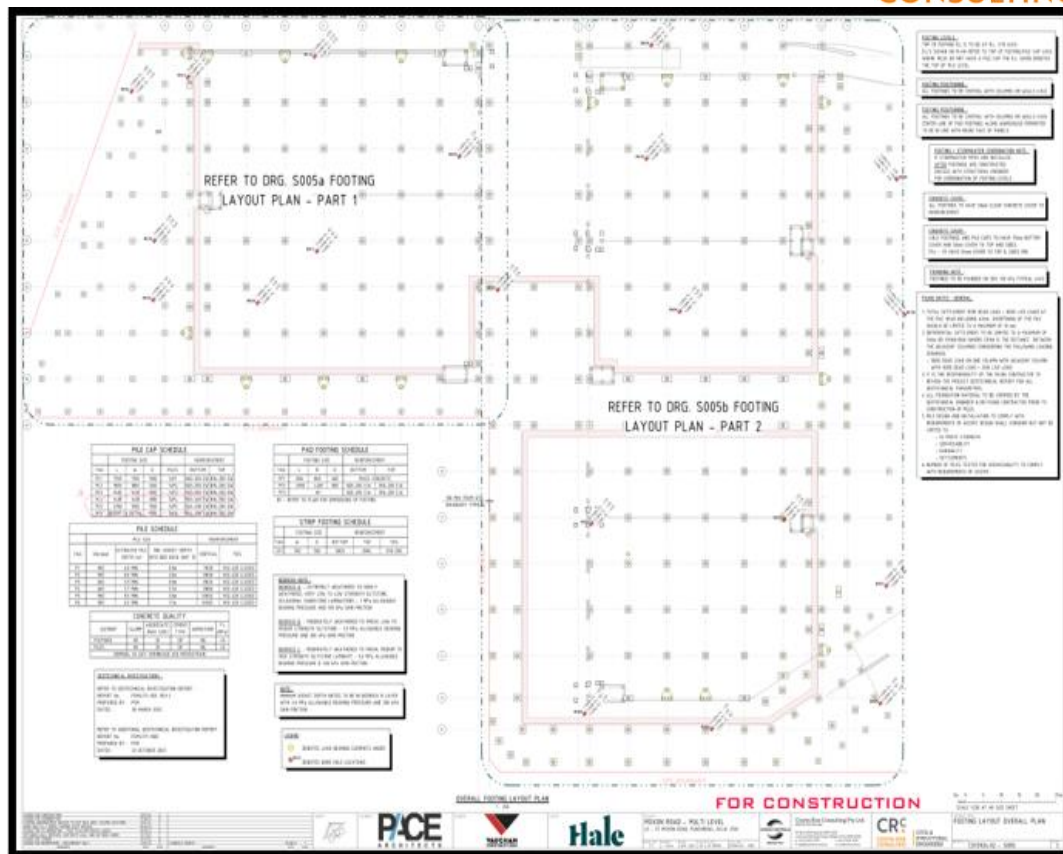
Overall Structural Footing Plan CO13924.02-S005 showing the locations of the columns within the flood conveyance zone
